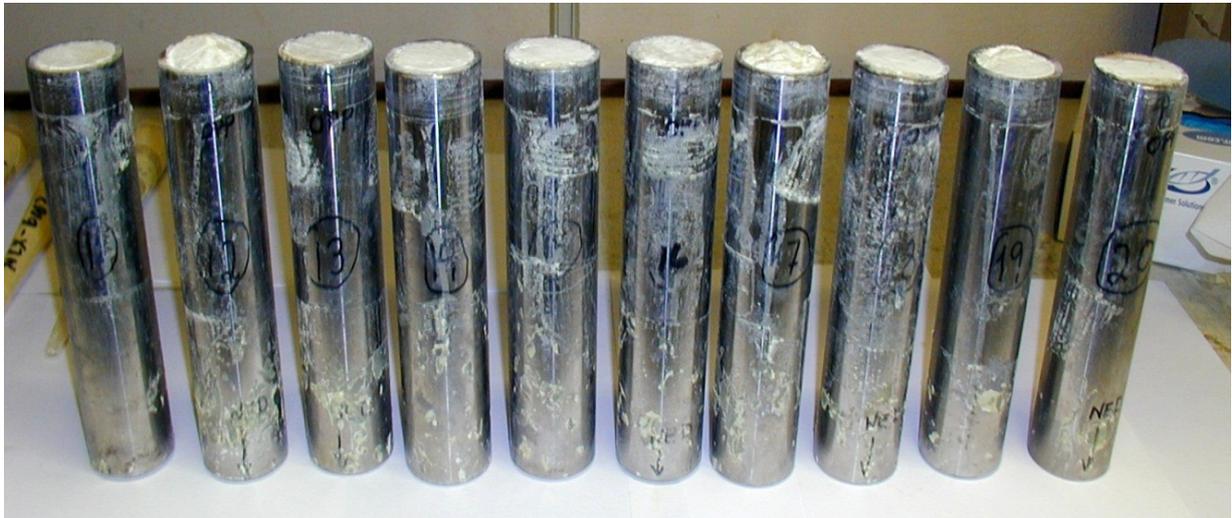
The figure shows tubes No 11 to No 20 after casting.
